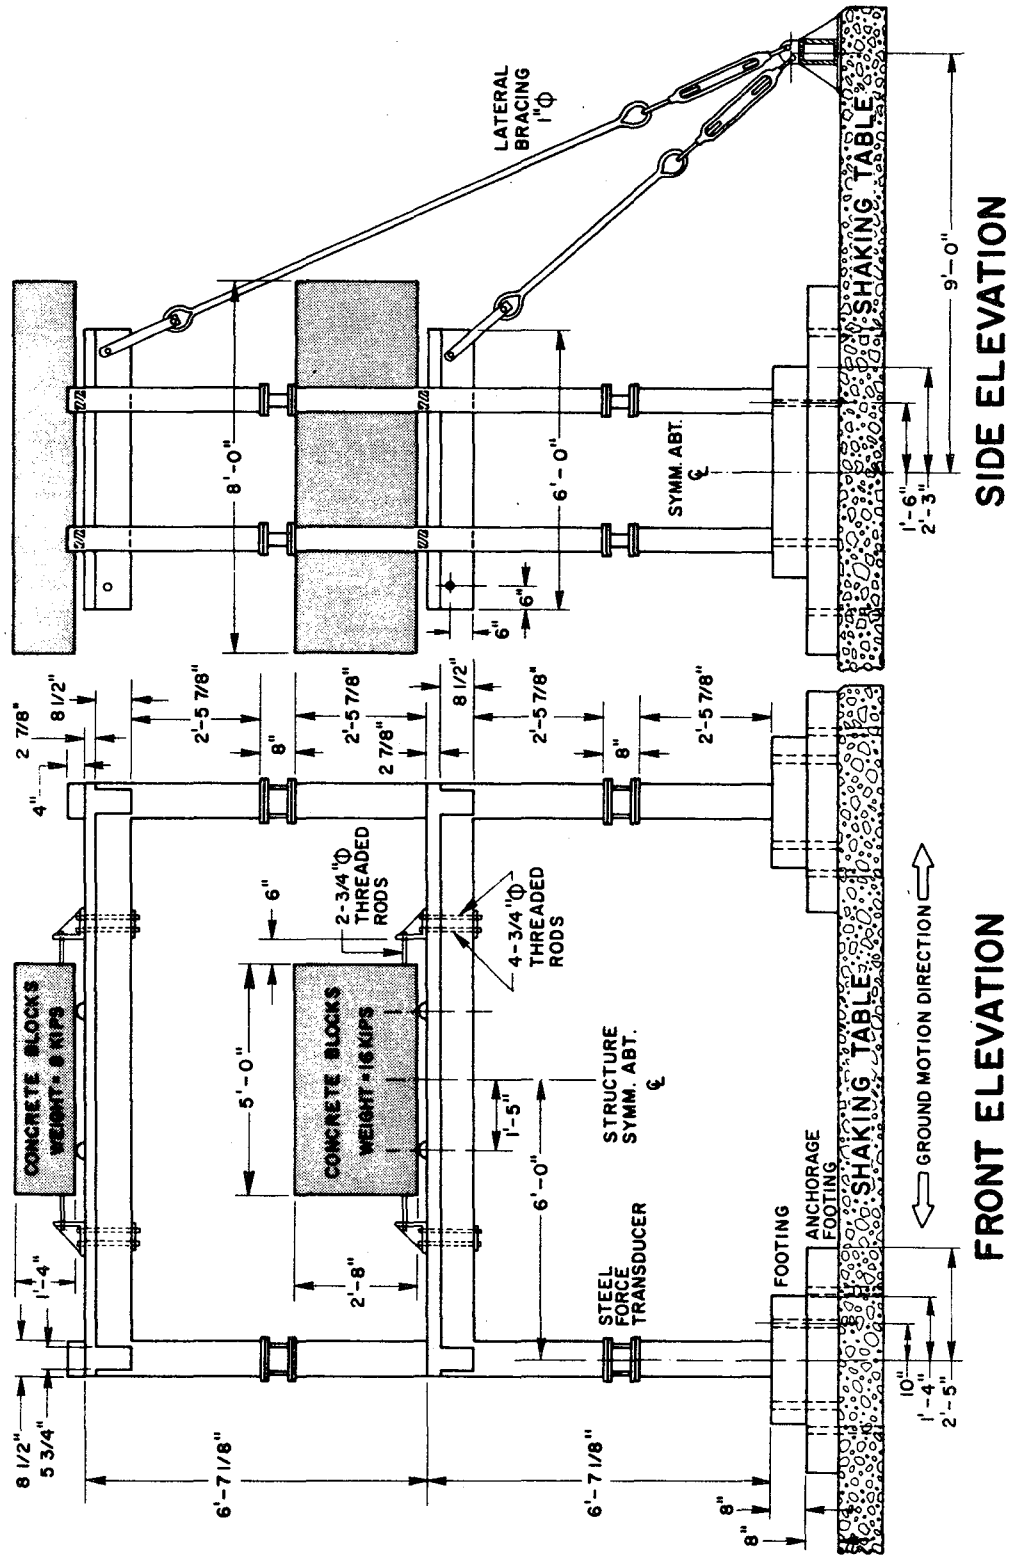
TEST STRUCTURE AND SHAKING TABLE ARRANGEMENT.
